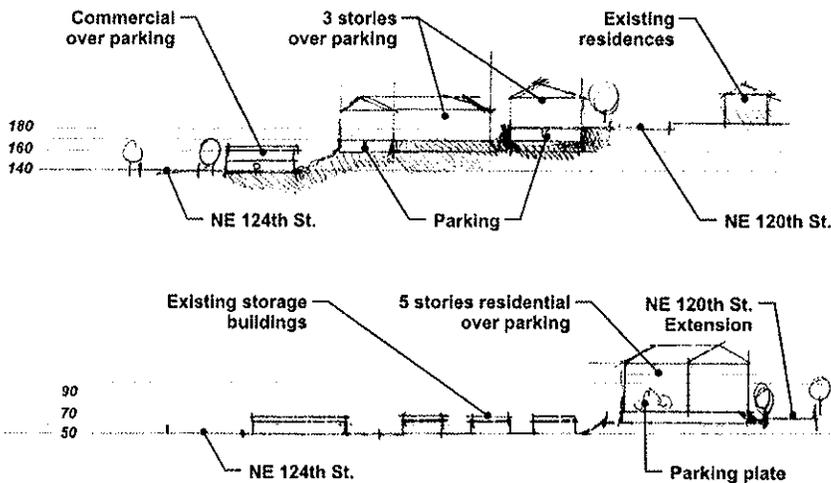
Redevelopment concept incorporating multi-family uses along Slater Avenue NE and planned NE 120<sup>th</sup> Avenue extension. Note how residential buildings are configured towards the street and around common open spaces. The section drawings above illustrate how development can take advantage of slopes.
